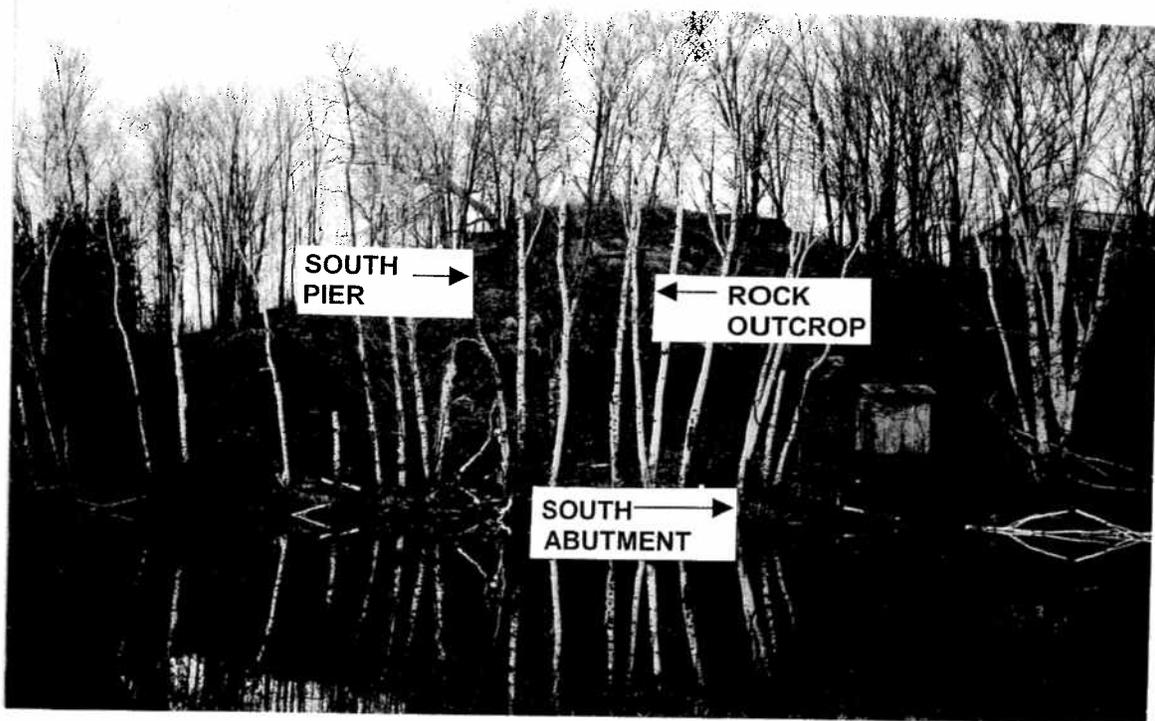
Looking southerly at south pier (stake at margin of lake) and south abutment (stake on east side of rock outcrop). Elevation difference is 10.6 m.
